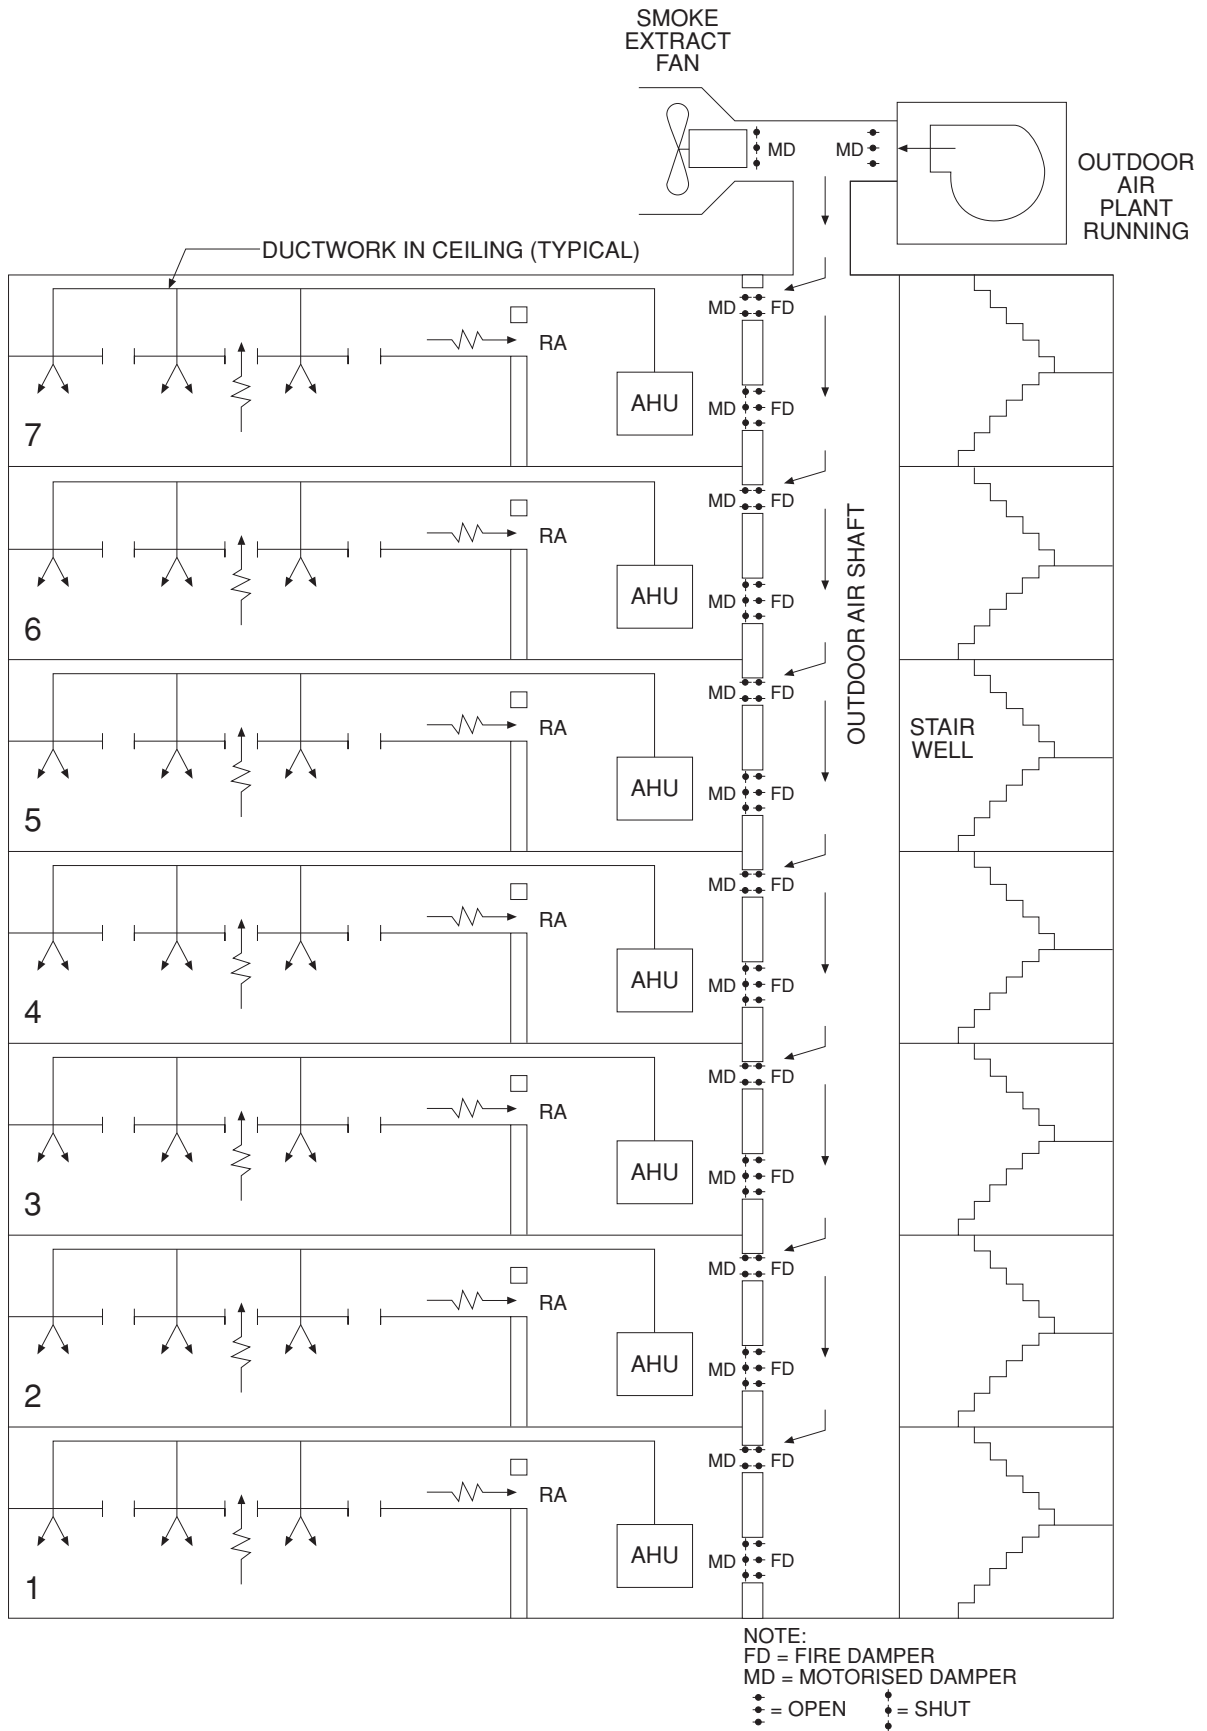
Typical floor-by-floor HVAC, on-floor AHU
